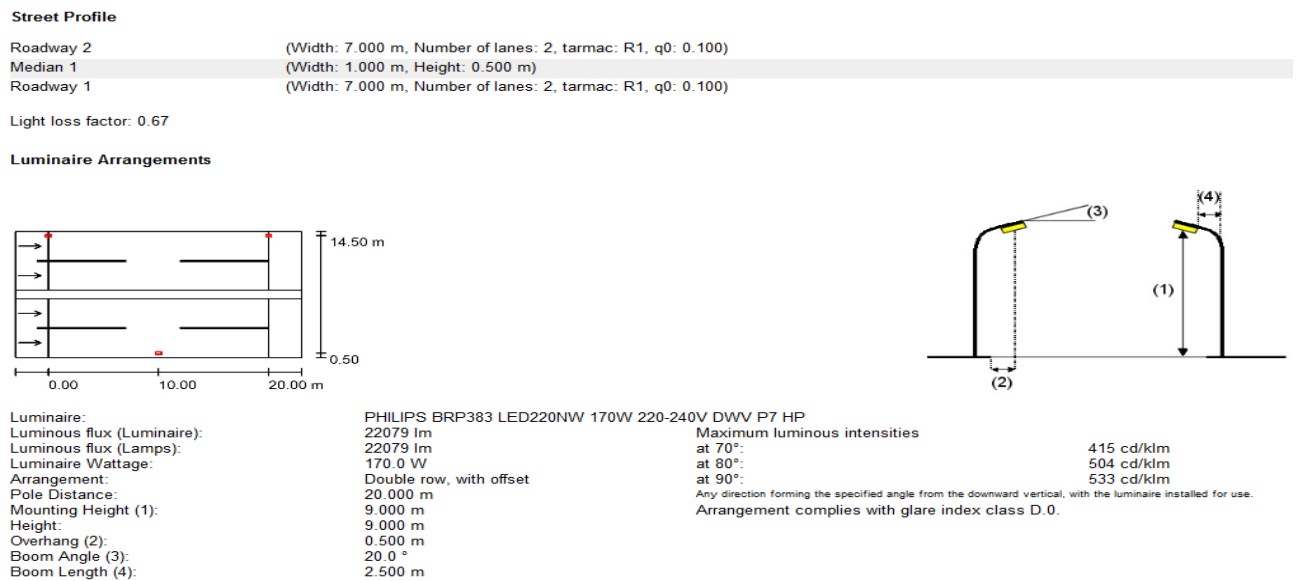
Street & Luminaire Planning Details of plan VIII
